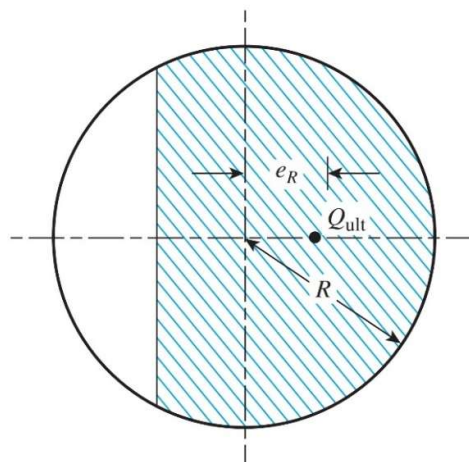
Circular Footing Under Eccentric Loading (Das, 2011)
